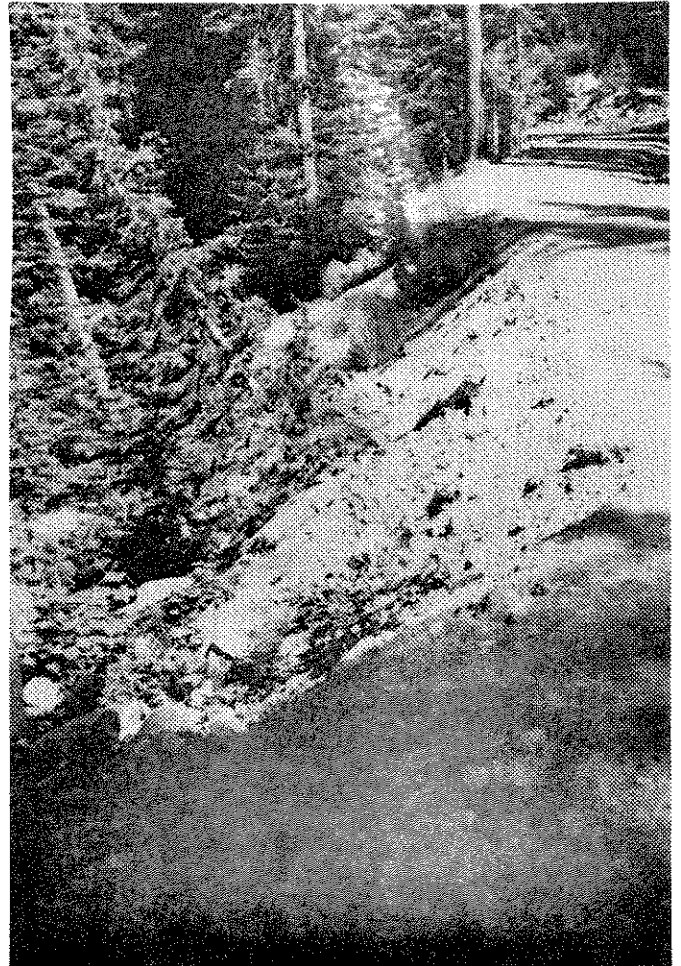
Unvegetated fill slope on a road adjacent to the East Fork of Lolo Creek; the road is about 15 feet from the stream.
